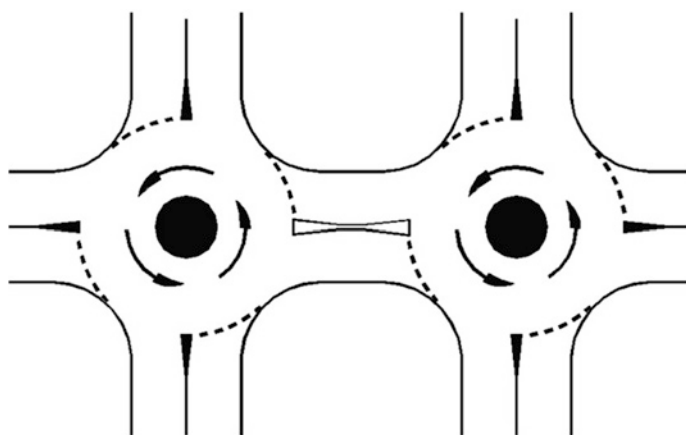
Double mini-roundabout with short central link road; sketch
